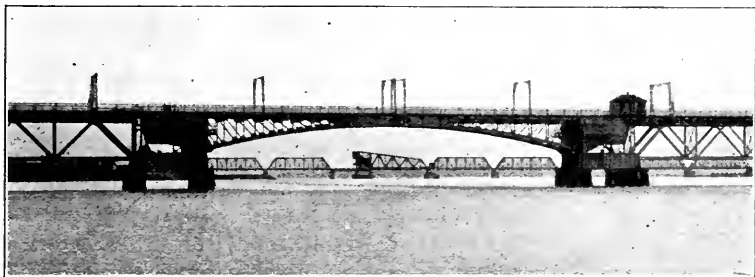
Rolling Lift Bridge Over the Connecticut River at Saybrook, Conn.
